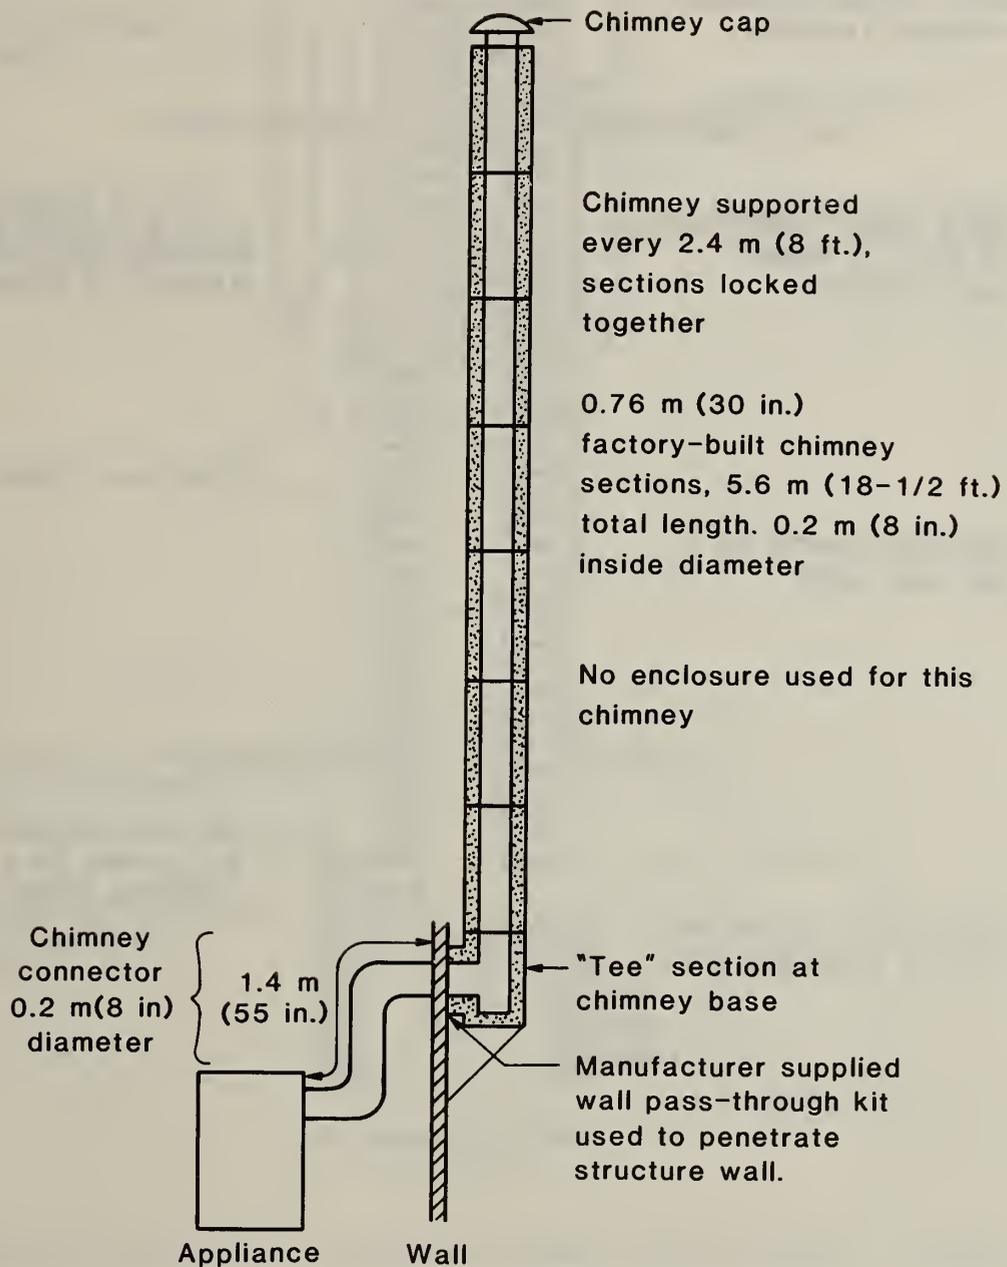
Installation of Factory-Built Chimney 5 for Chimney Fire Tests.
